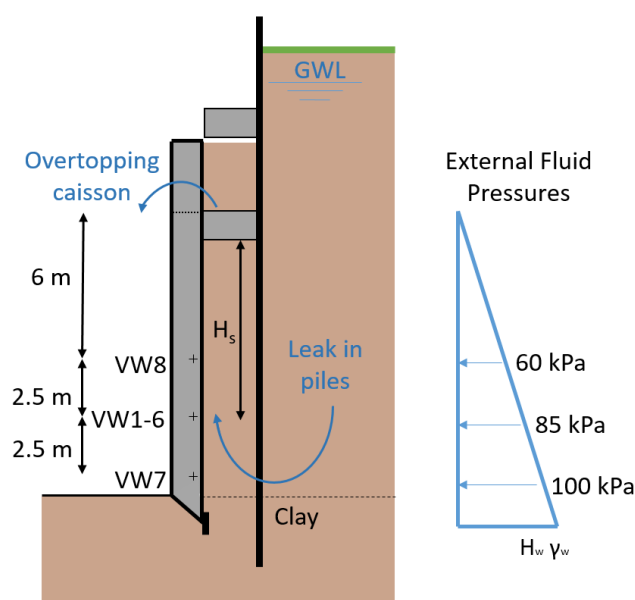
Normal contact loads and hoop strain in caisson wall.
